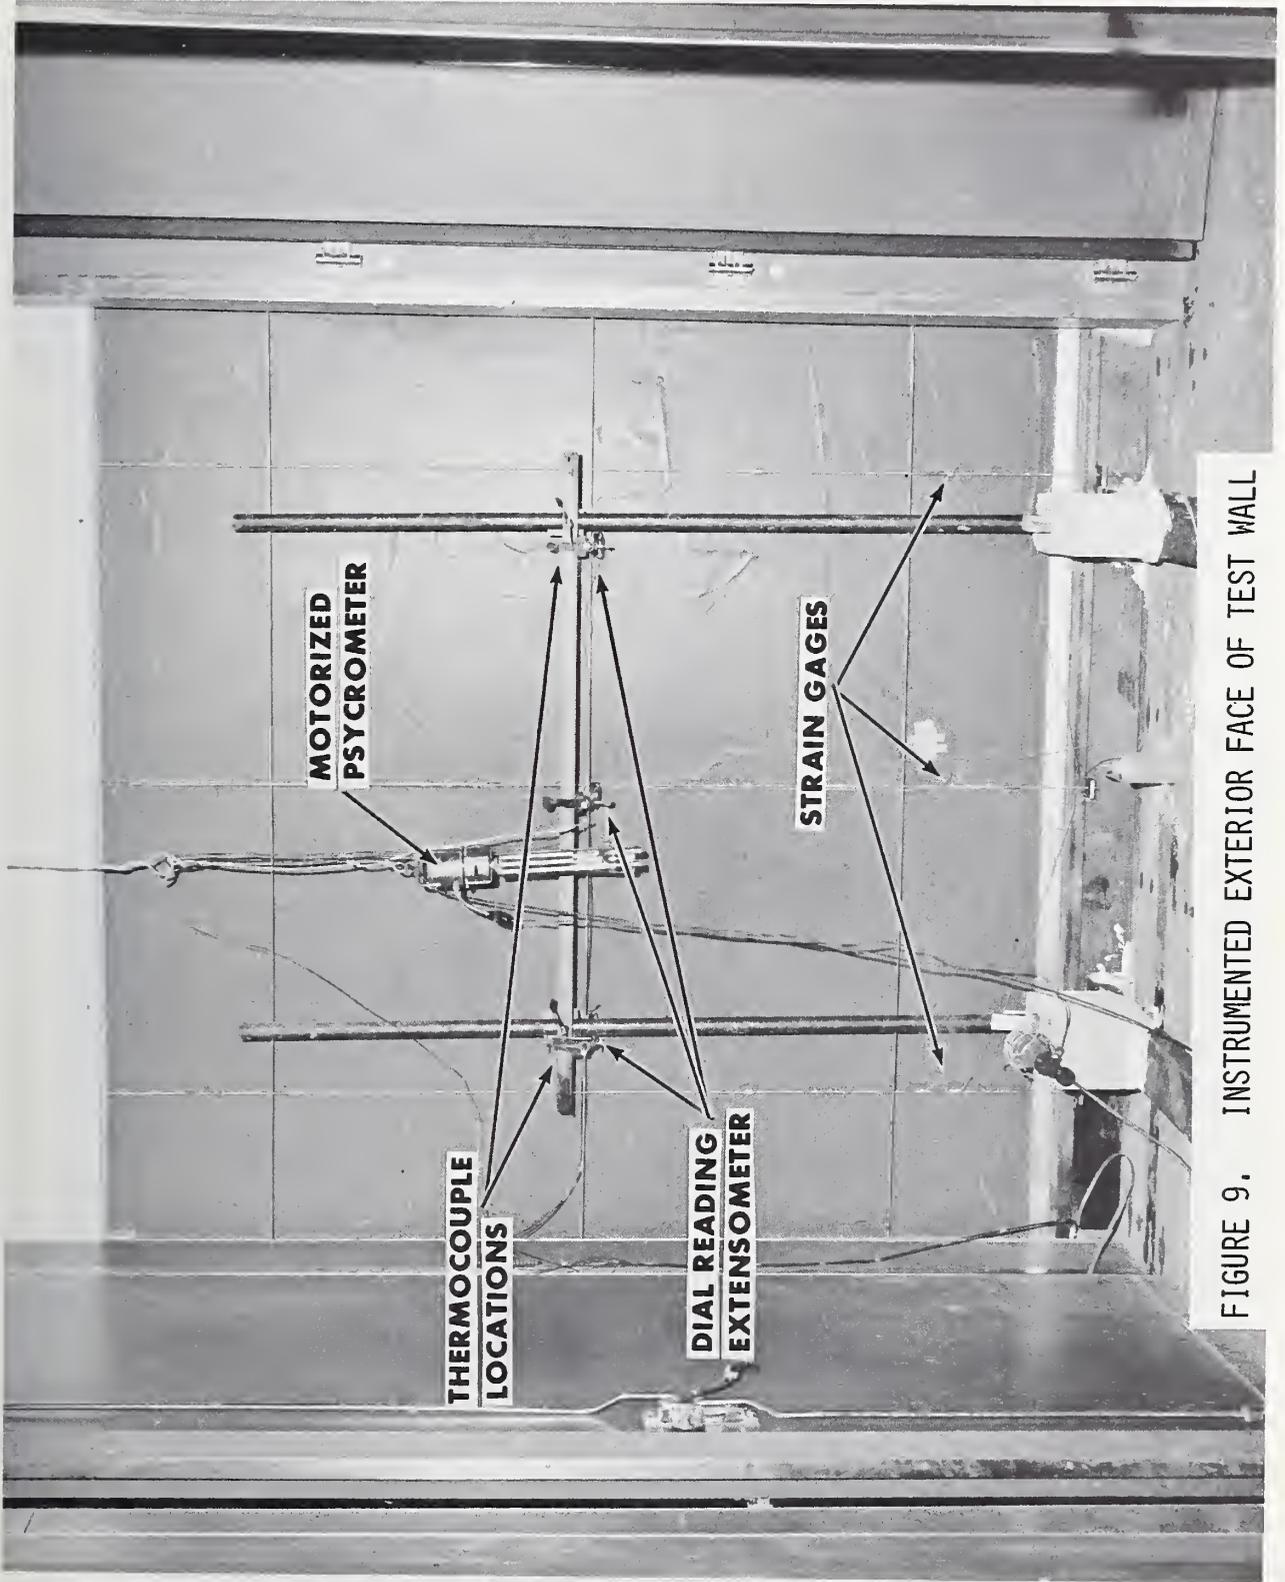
INSTRUMENTED EXTERIOR FACE OF TEST WALL
